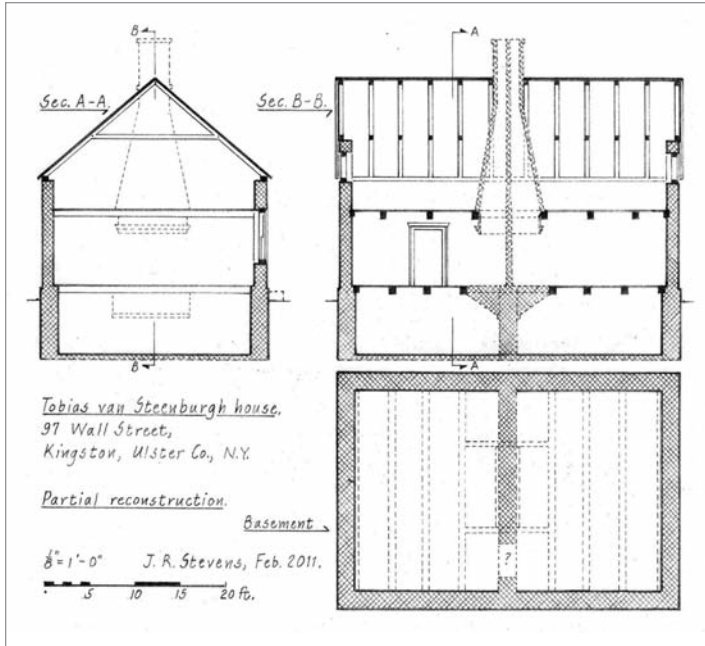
Tobias van Steenburgh House, reconstructed sections and basement plan.
